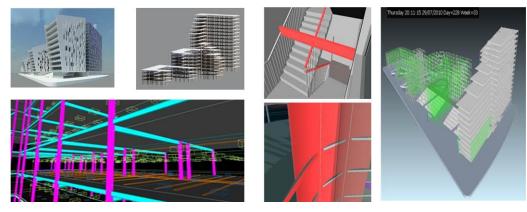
Architectural, Structural and HVAC Models (left) and Design coordination and 4D planning model (right)
